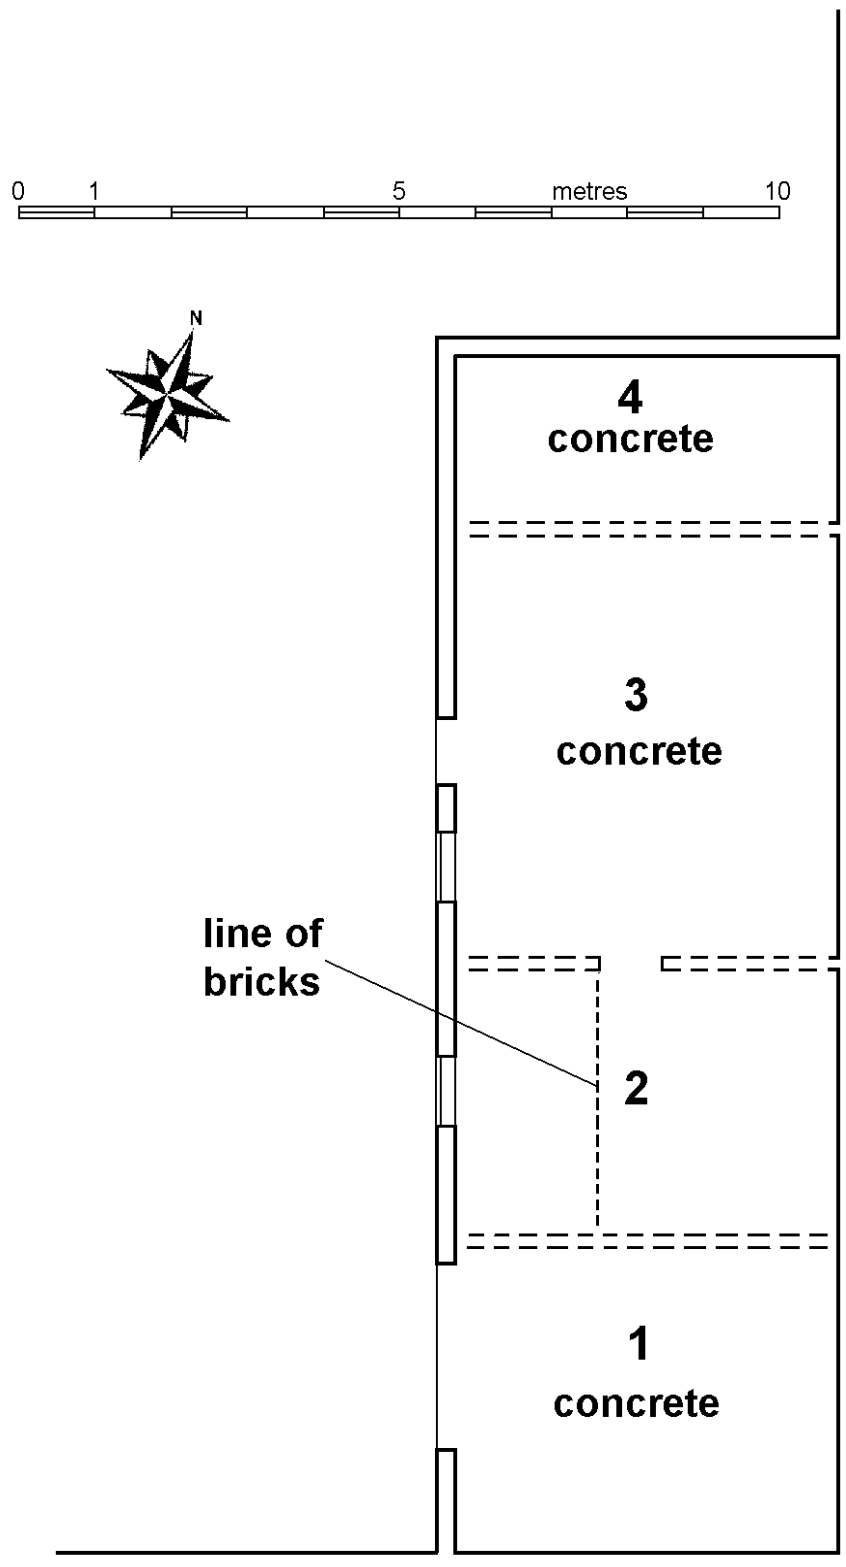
Reconstructed plan of the building (*scale 1:100*)
